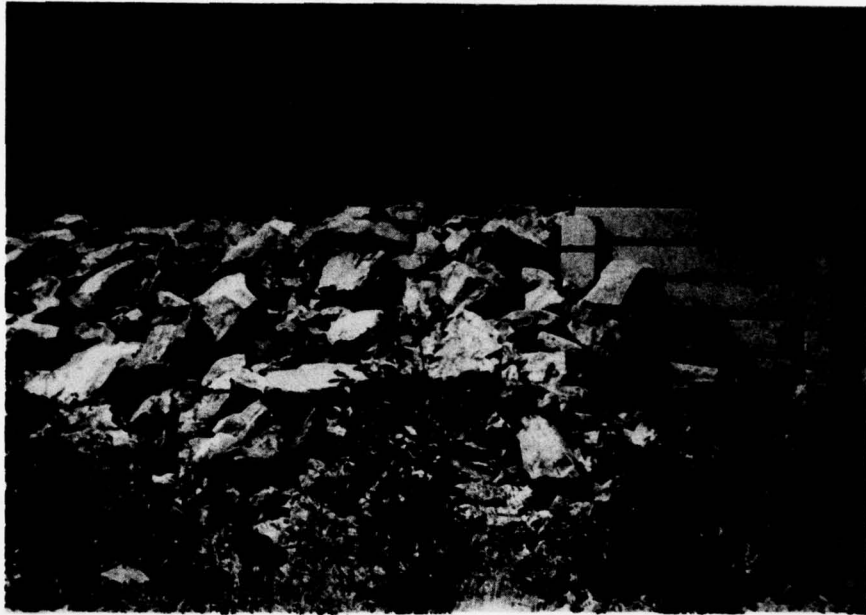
View of crib wall connection with rock fill left embankment taken from river bank. (Photo taken August 3, 1978).
